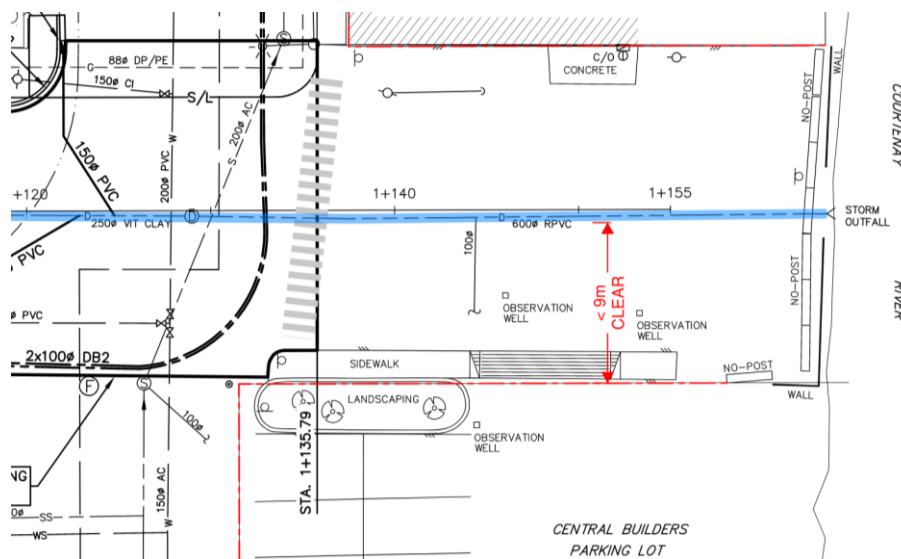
6th Street road reconstruction works (2008) with storm sewer highlighted in blue
